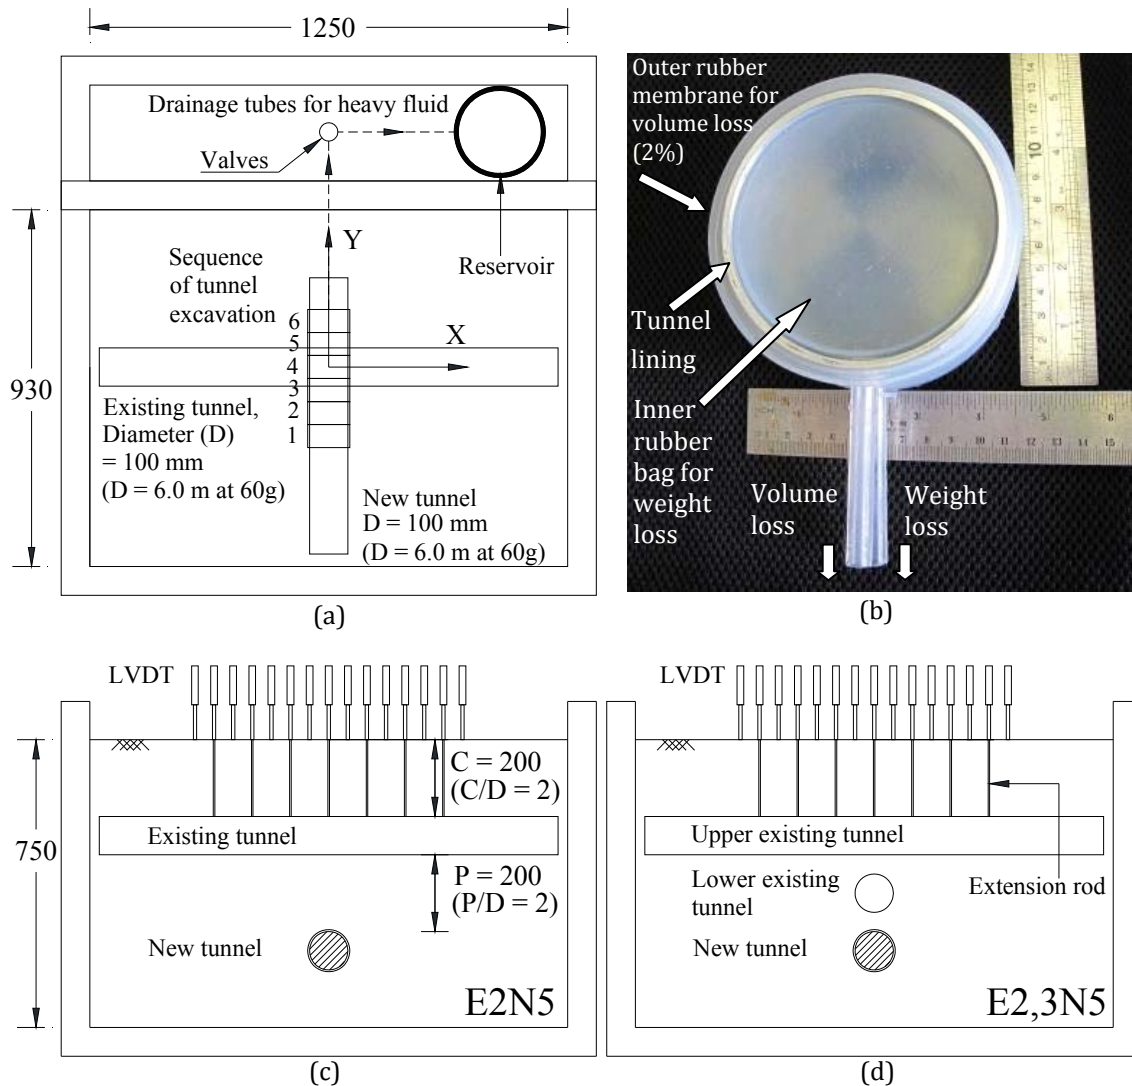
Centrifuge model setup: (a) Plan; (b) “Donut” for simulating tunnel excavation (modified from Ng et al. 2013); (c) Test E2N5; (d) Test E2,3N5
